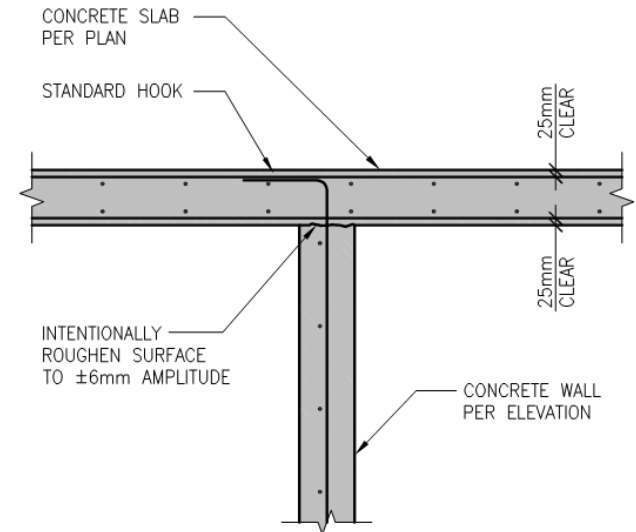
DETAILS REFERENCED IN PLAN (CONCRETE ELEVATED SLAB)
